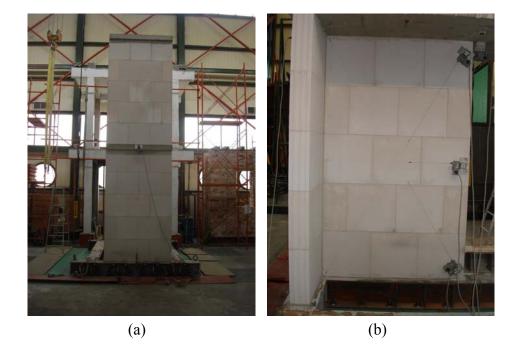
Specimen A2: (a): Cracks at the transversal wall of 2^{nd} level- Out of plane movement, (b): Cracks at the 1^{st} level in plane wall.
